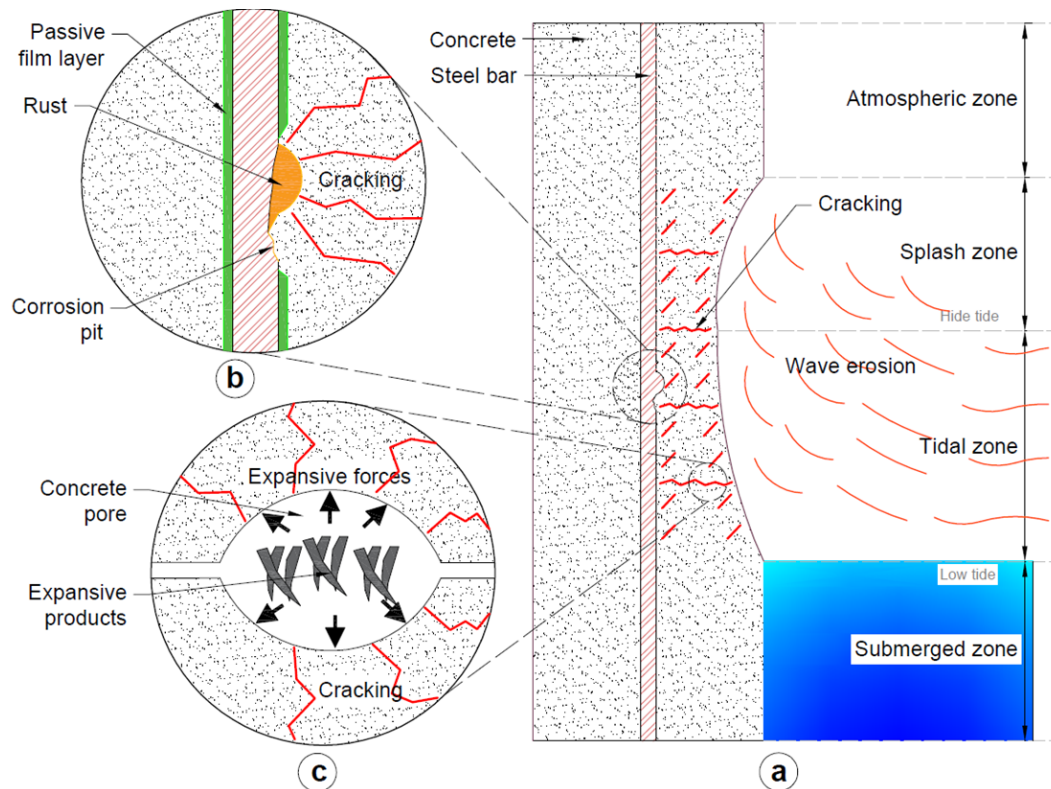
Concrete exposed to deterioration in marine environment: (a) Element of concrete structure, (b) steel corrosion and (c) damage by expansion (Mehta and Monteiro, 2006)
